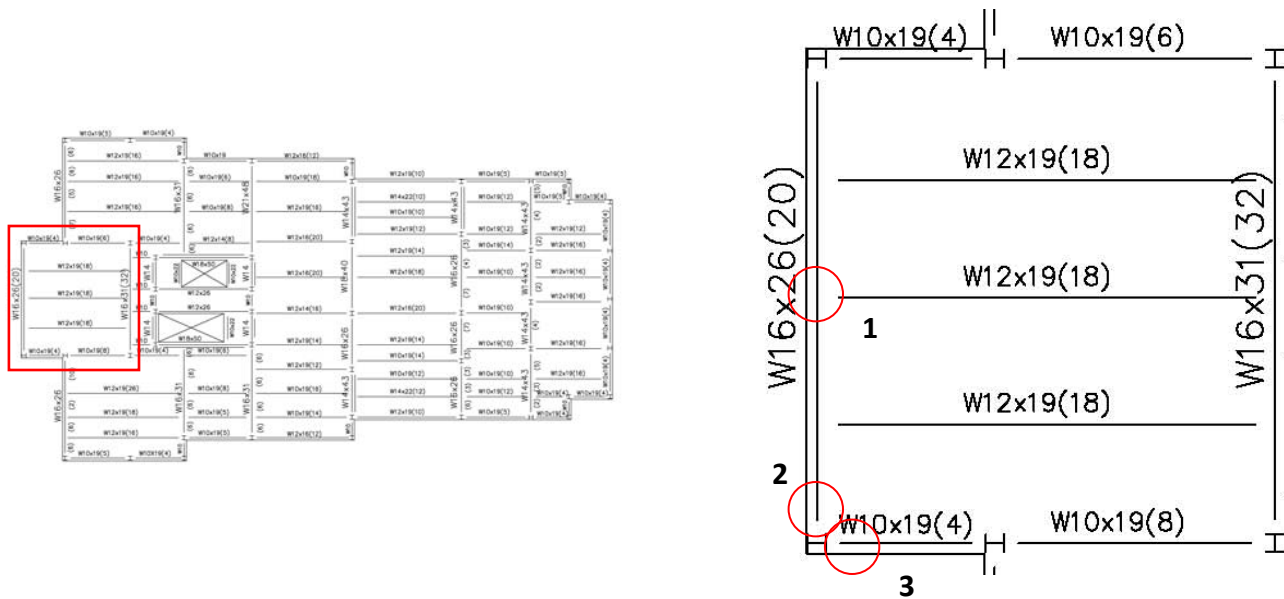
Typical composite steel bay with connection design locations. Typical bay located in red box on left.
